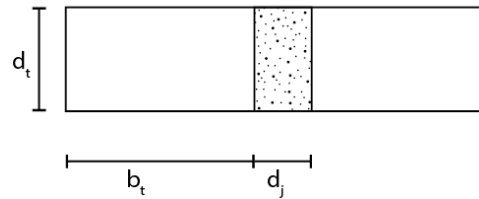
The block revetment is a sandwich beam consisting of concrete blocks and gap filling material
